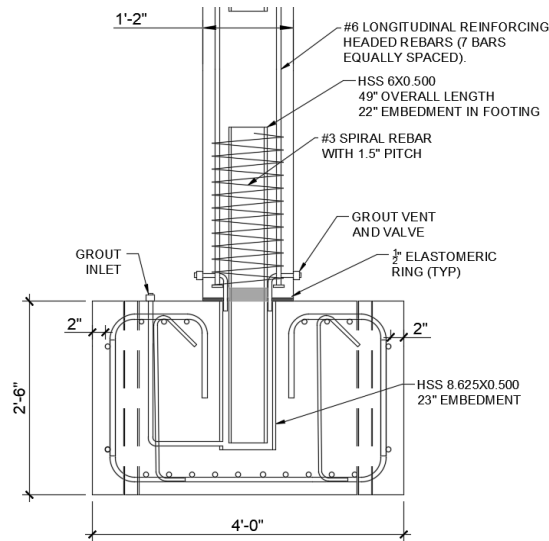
Pipe-Socket Connection for Column-to-Footing Connection (1’=30.4cm, and 1”=2.54cm)
